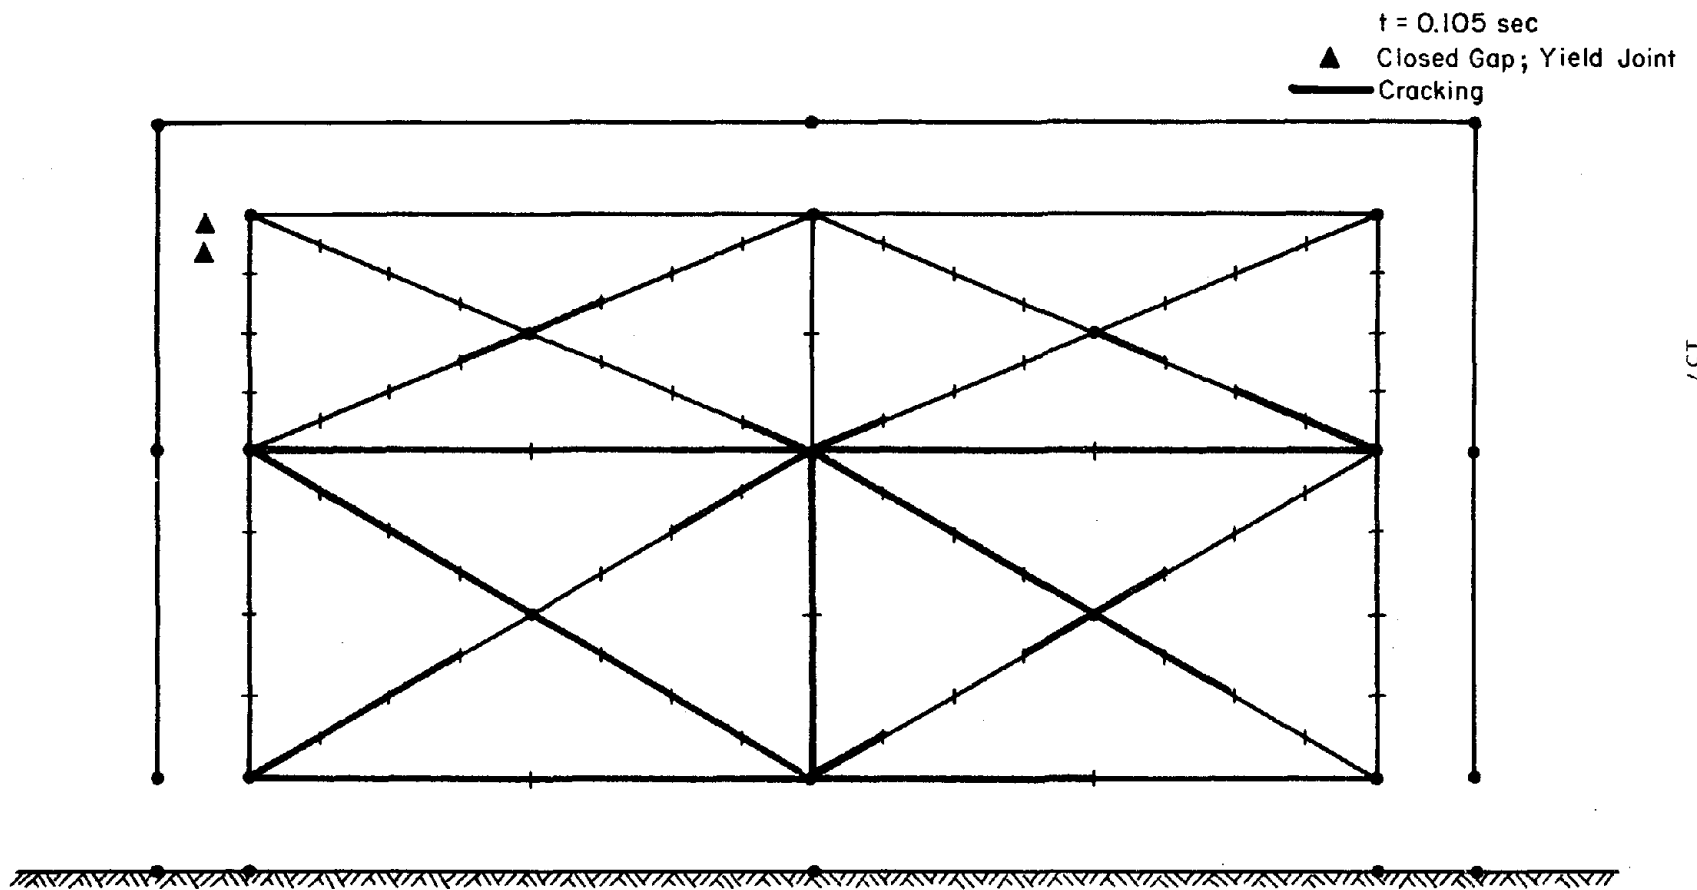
Crack Pattern: Frame Wall-Gaps(II) at t=0.105 sec
